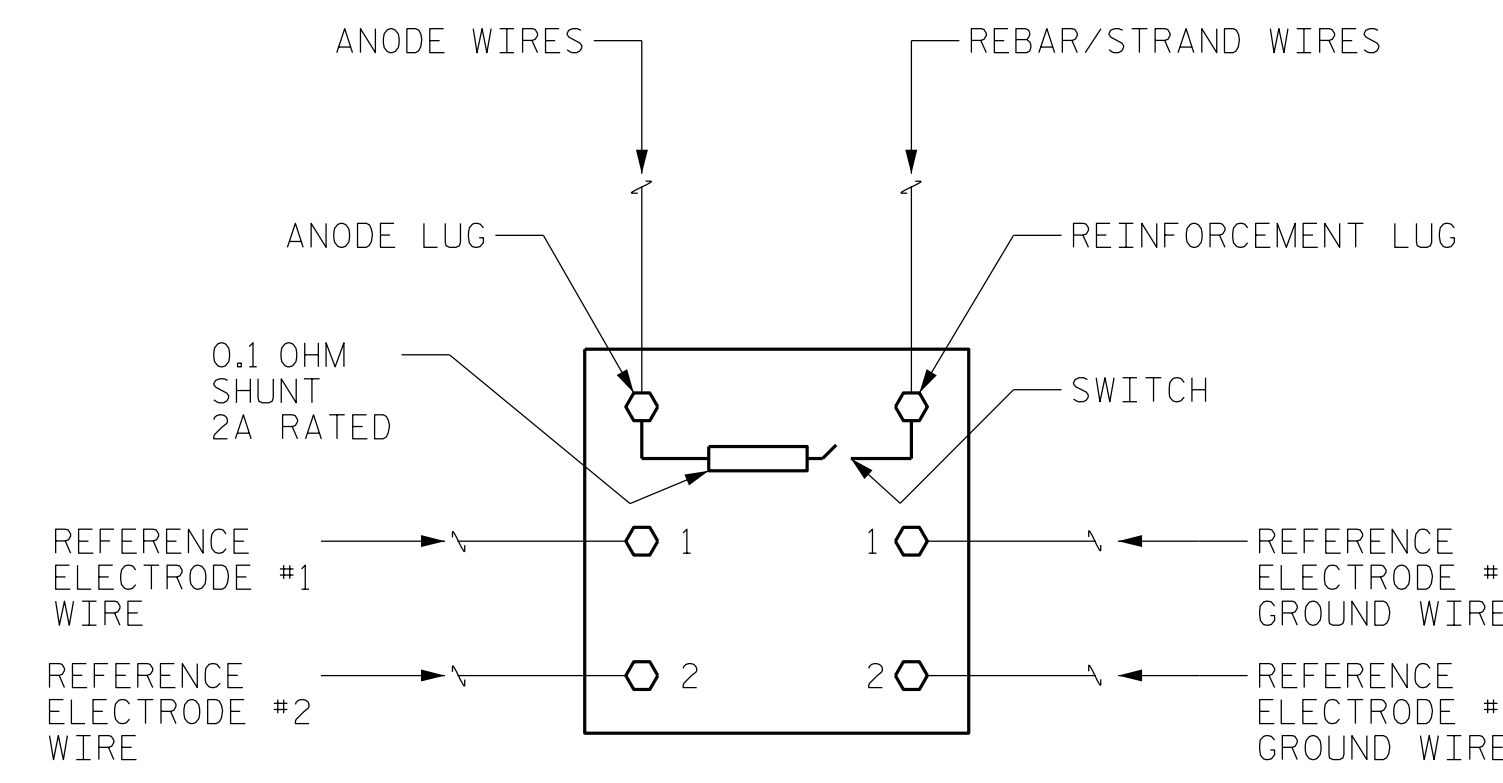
ANODE CONNECTION PLATE DETAIL (CP NON-MONITORING)
